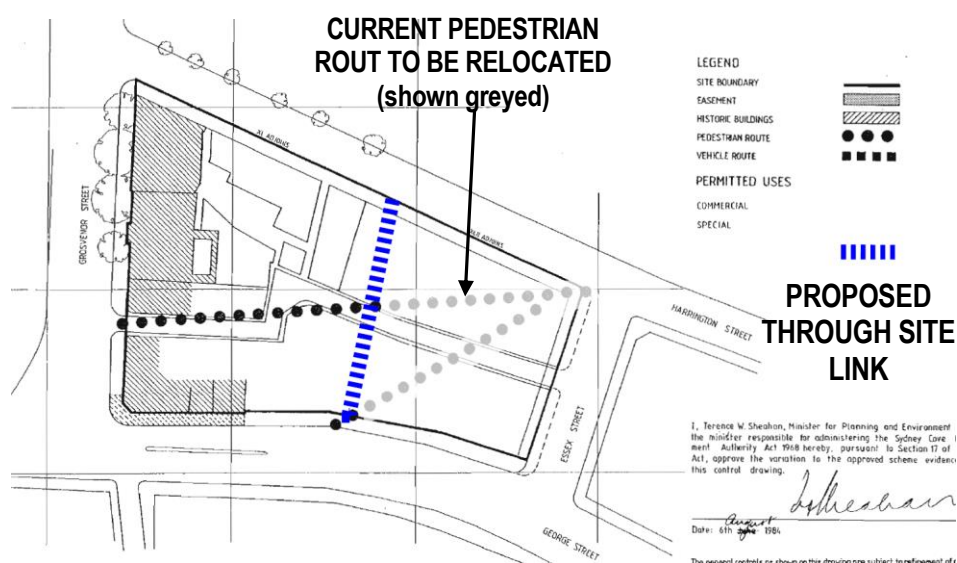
Building Site Control Drawing XLIV-A- Grosvenor Place
